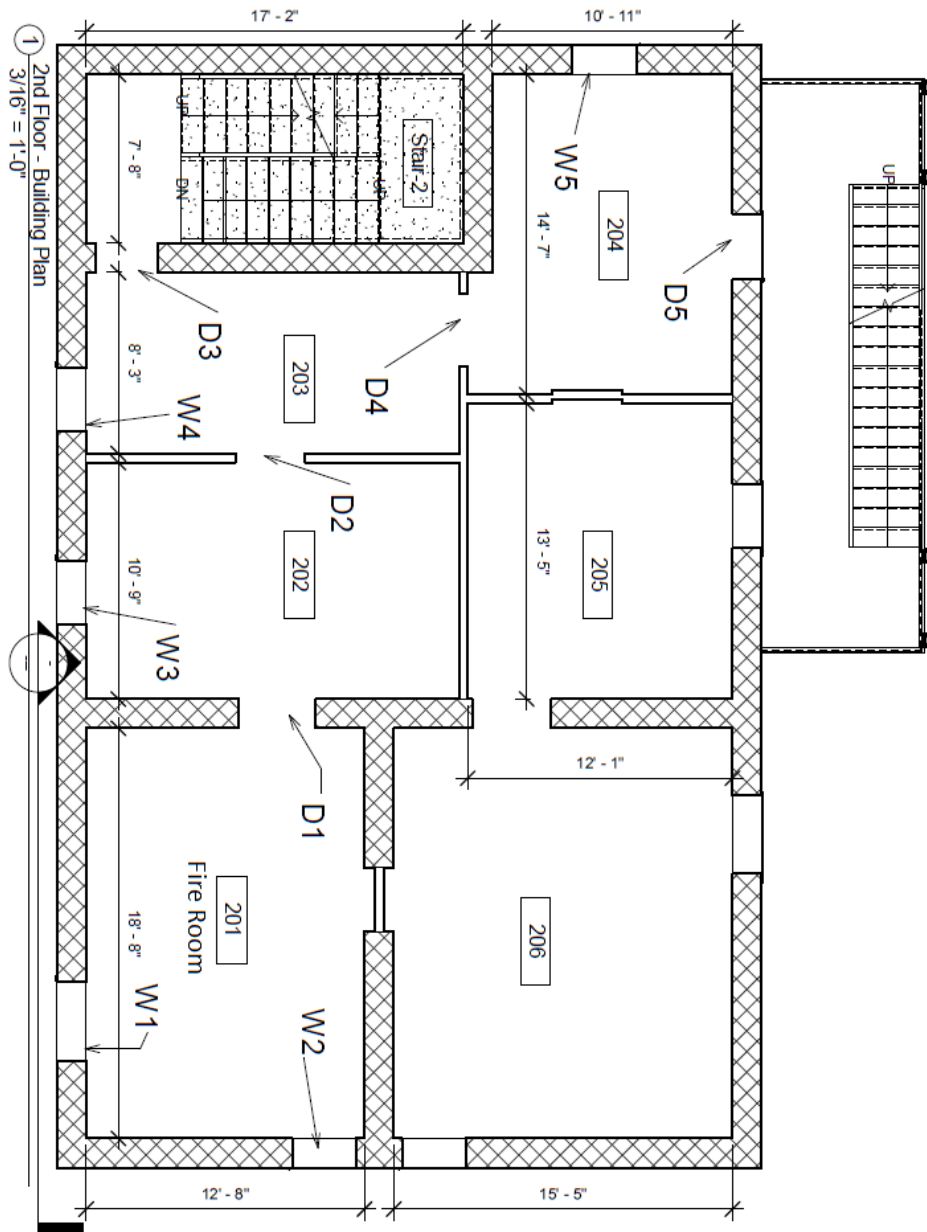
Second Floor Layout of Concrete Burn Structure
